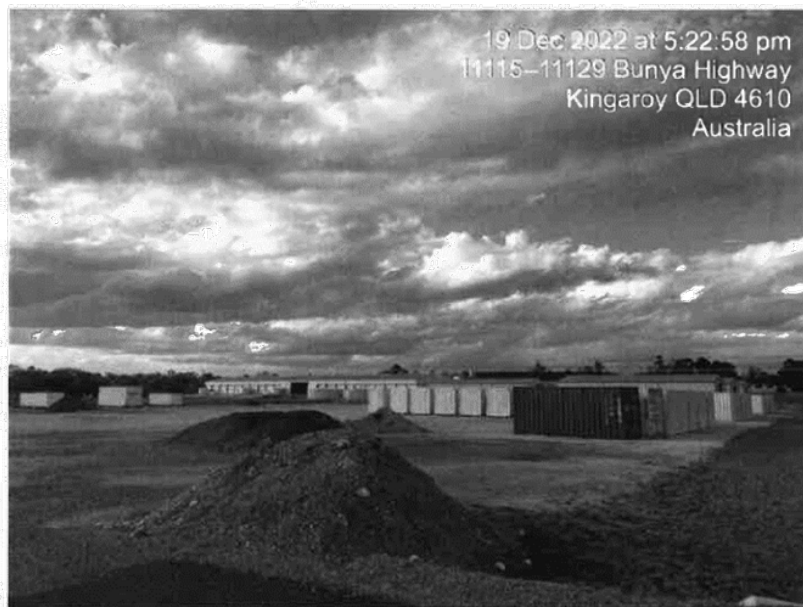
Figure 2 - Pre-development site photo (Gravel hardstand)
